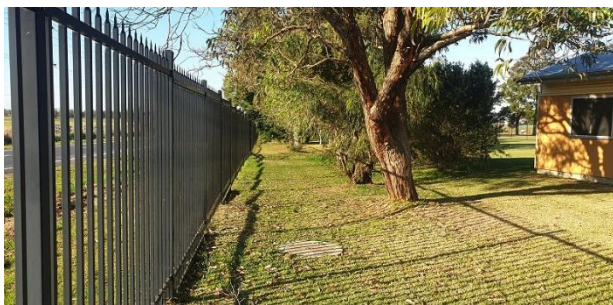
From west of northern end of proposed car park area, facing northeast. Existing “D Block” visible.
